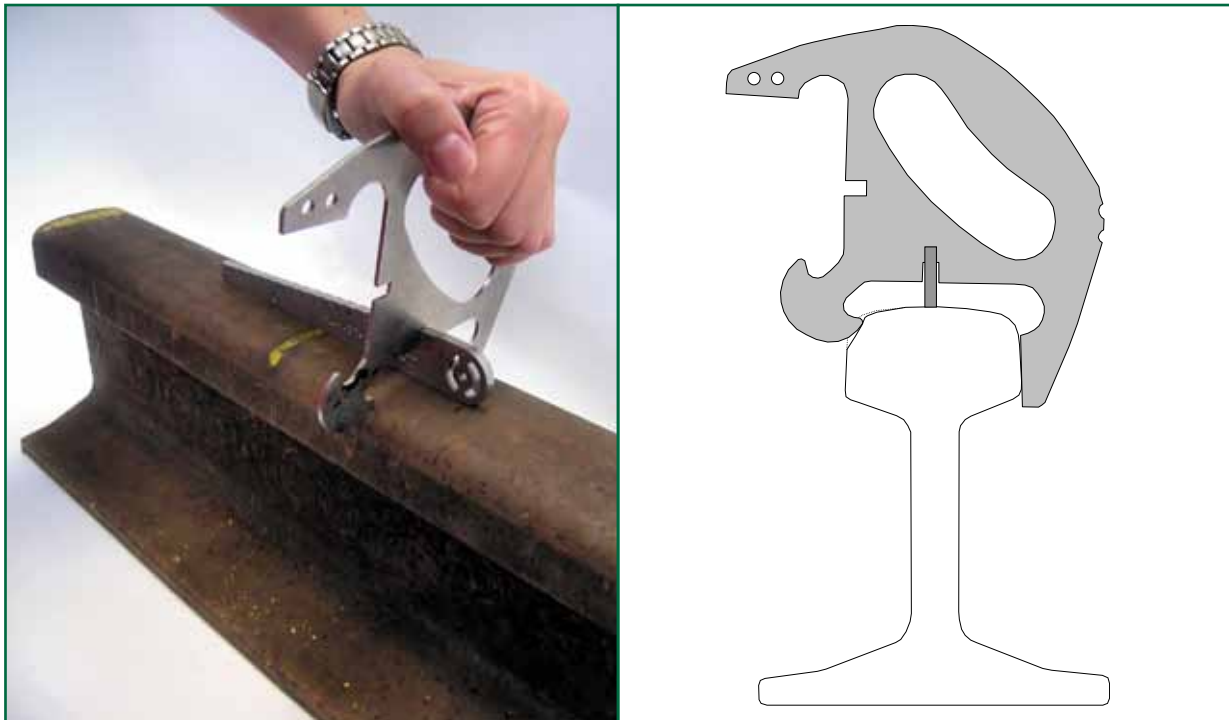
Illustrations of NR4 sidewear gauge on new and sideworn rail
